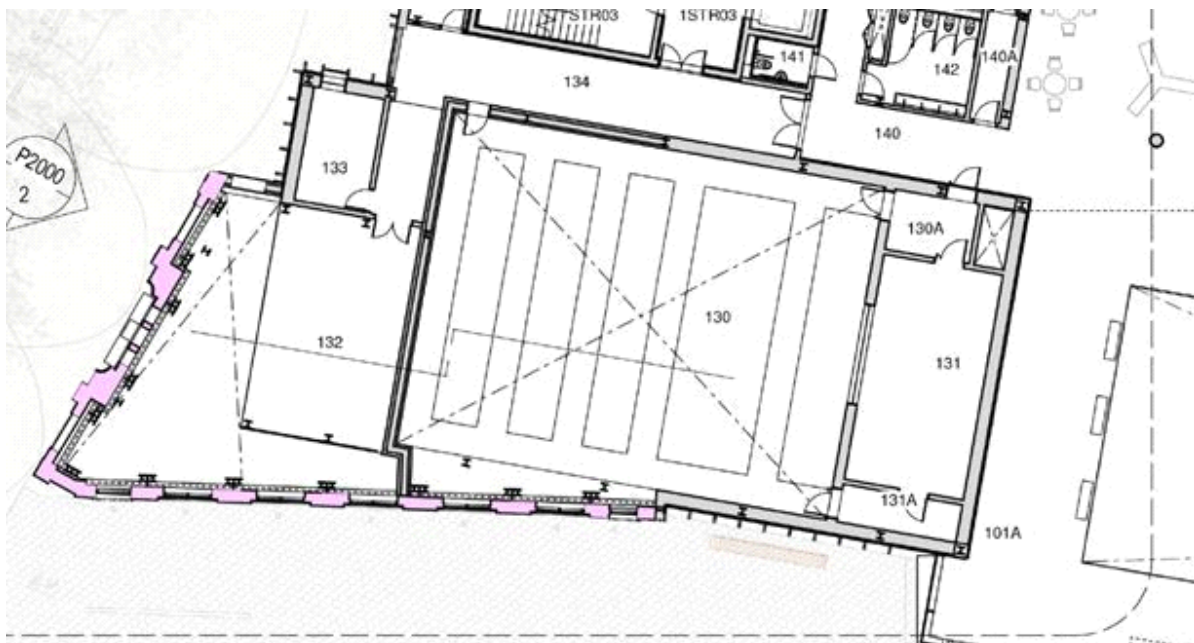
The proposed ground floor plan of the Performing Arts Centre. The walls of the original Chapel to be retained are highlighted in pink.
